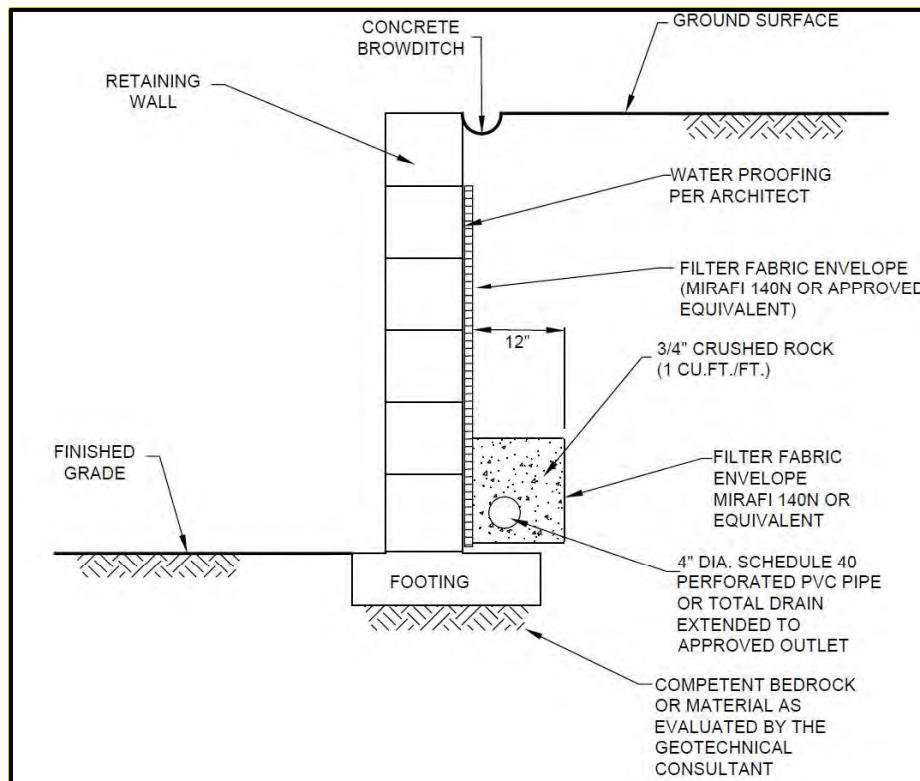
Typical Conventional Retaining Wall Backdrain Details
